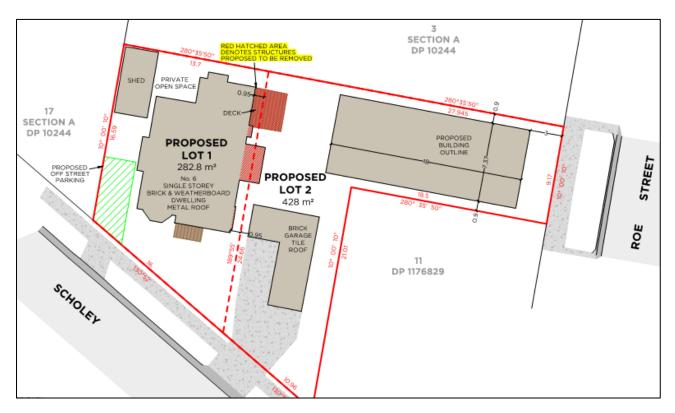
Plan showing demolition and minor works proposed to facilitate subdivision.
